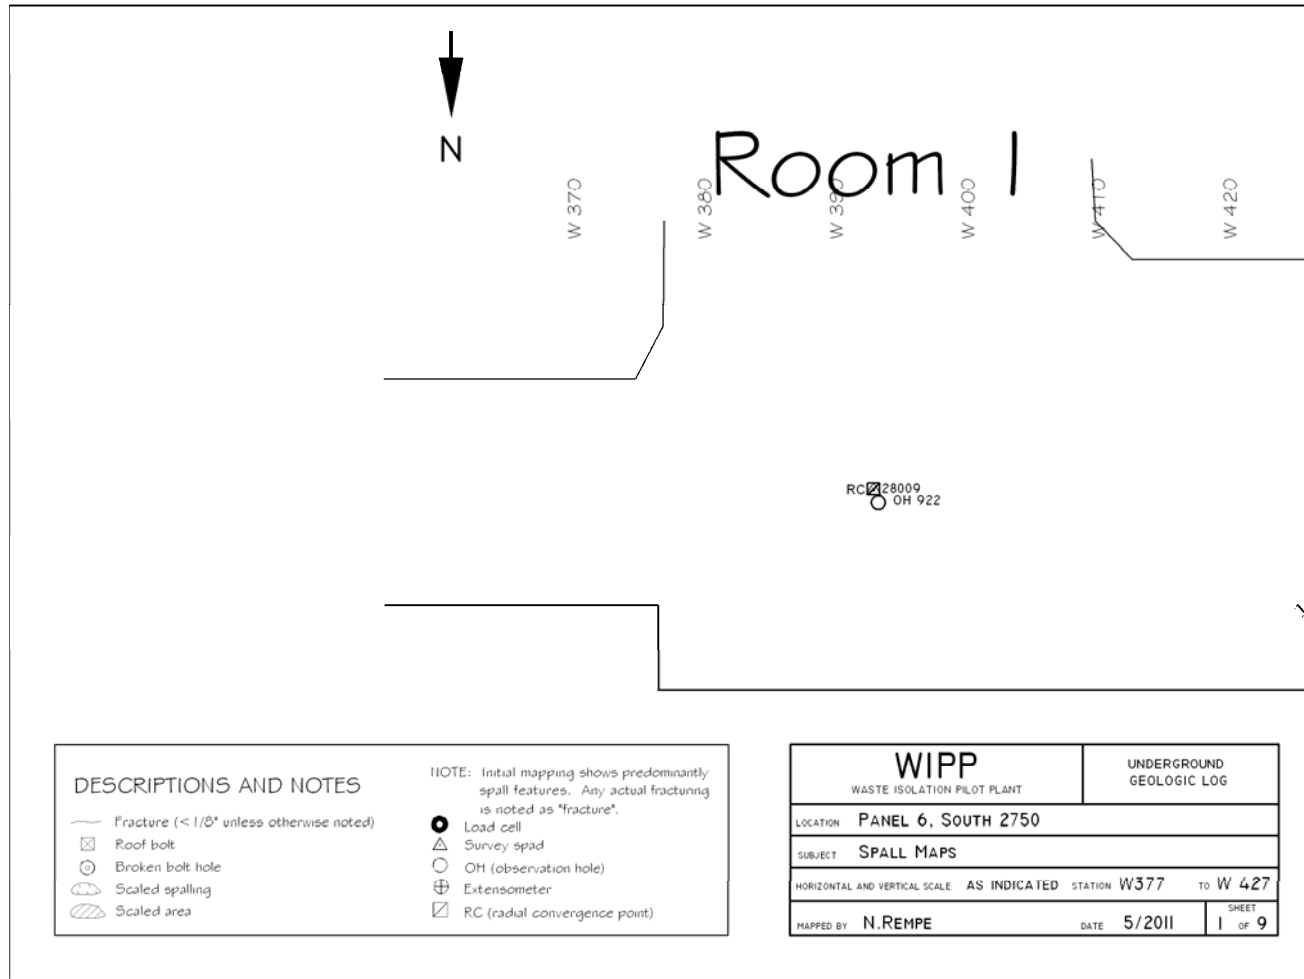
Panel 6 S2750, W390-W1210 Roof Fractures (Sheet 1 of 9)
